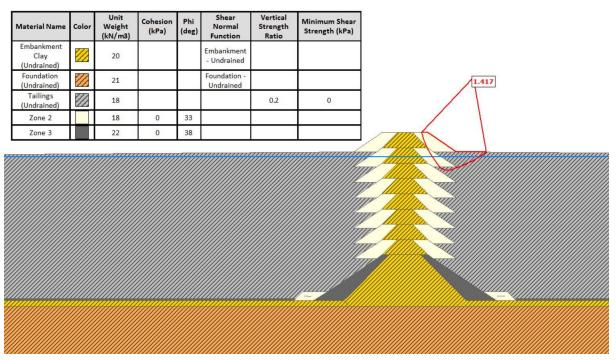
Slip Surface in Common Wall, Short-term Undrained Loading Condition
